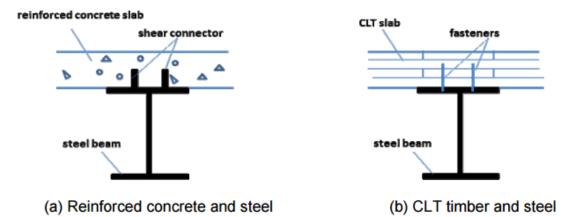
Connections between slab and steel frame. (Adapted from Asiz & Ahmed 2013)
